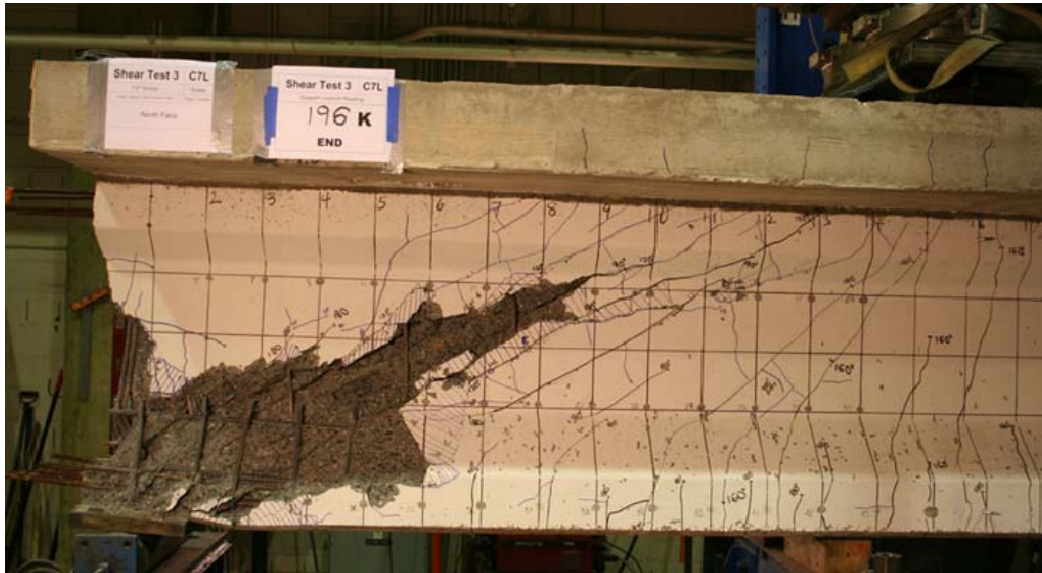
Shear Failure of Girder End C7L (Type SS)
